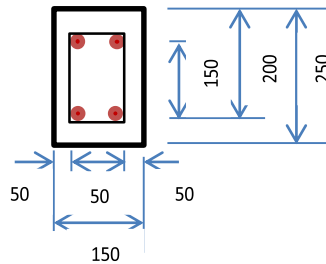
Details of the arrangement of reinforcement bars: Cross-sectional view, unit =mm
